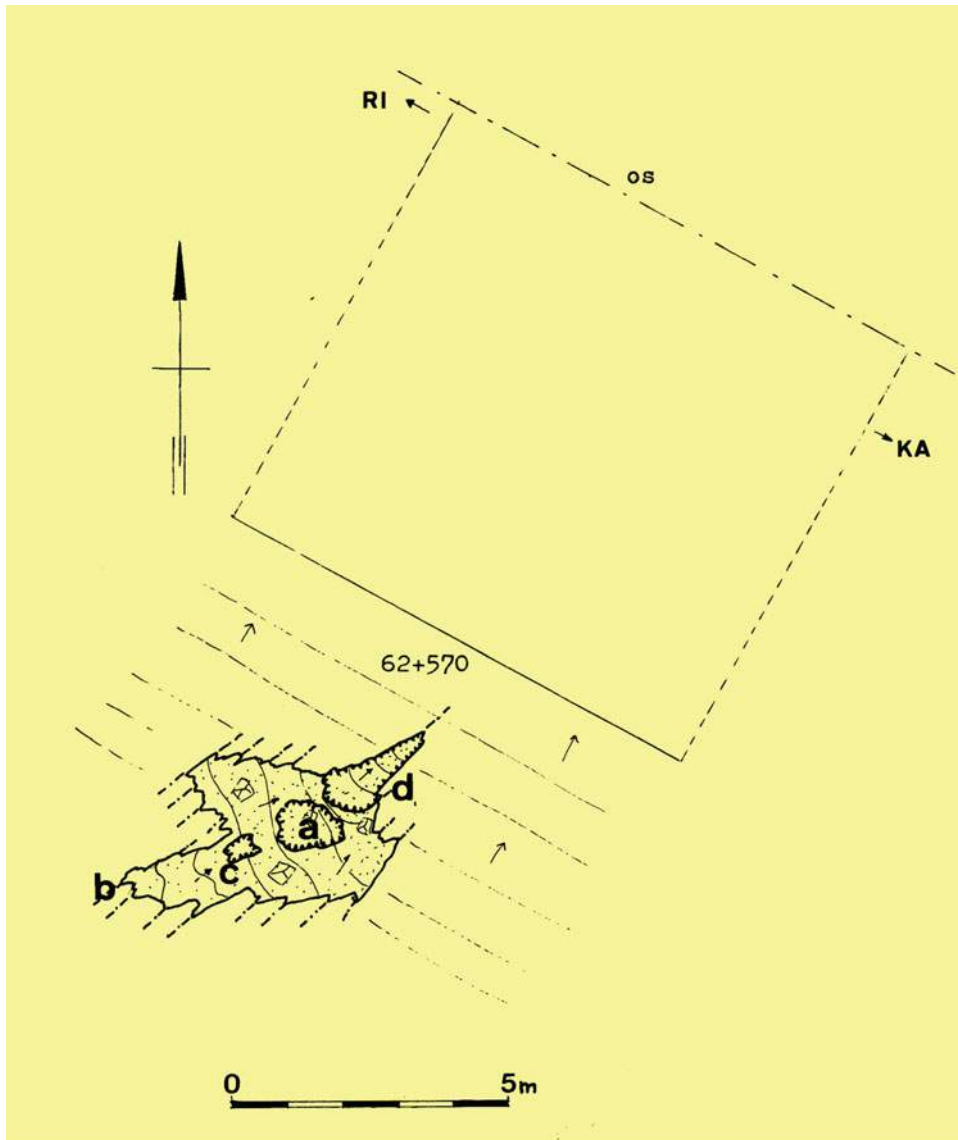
Plan of cavern at km 62 + 570 on A-6 highway, Kupjak—Vrbovsko section
